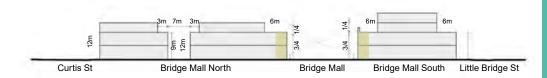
Existing built form section for Sub-Area 3: Bakery Hill - Section G
